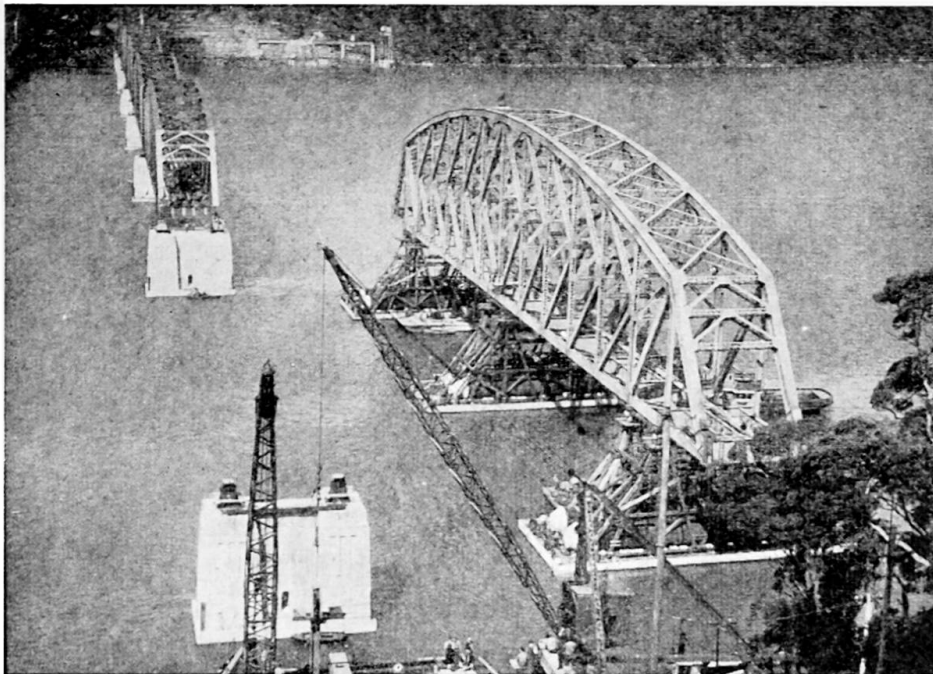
New Hawkesbury River Railway Bridge. Floating in 445-ft. span
